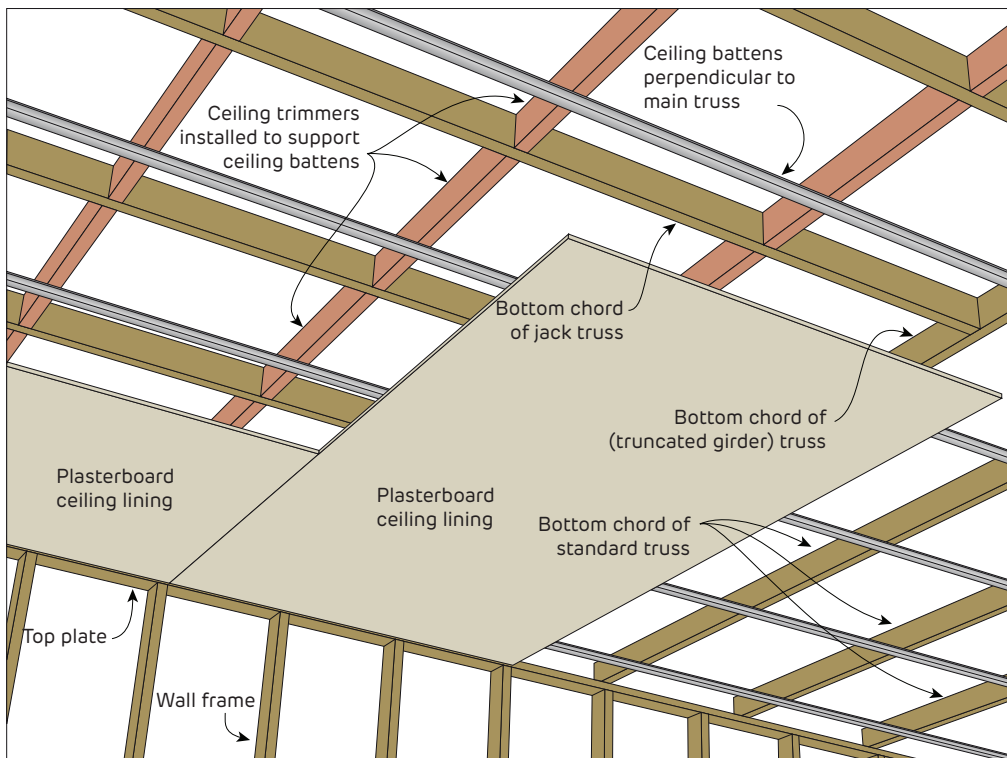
Trimmers to Support Ceiling Battens at Change of Truss Direction
